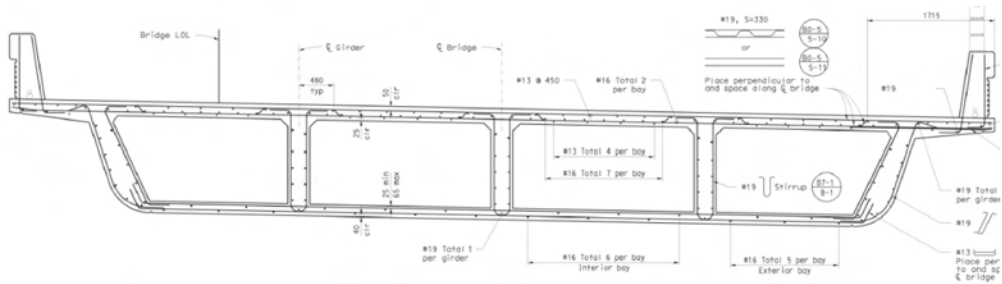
Cross-section view of Markham Ravine Bridge deck
